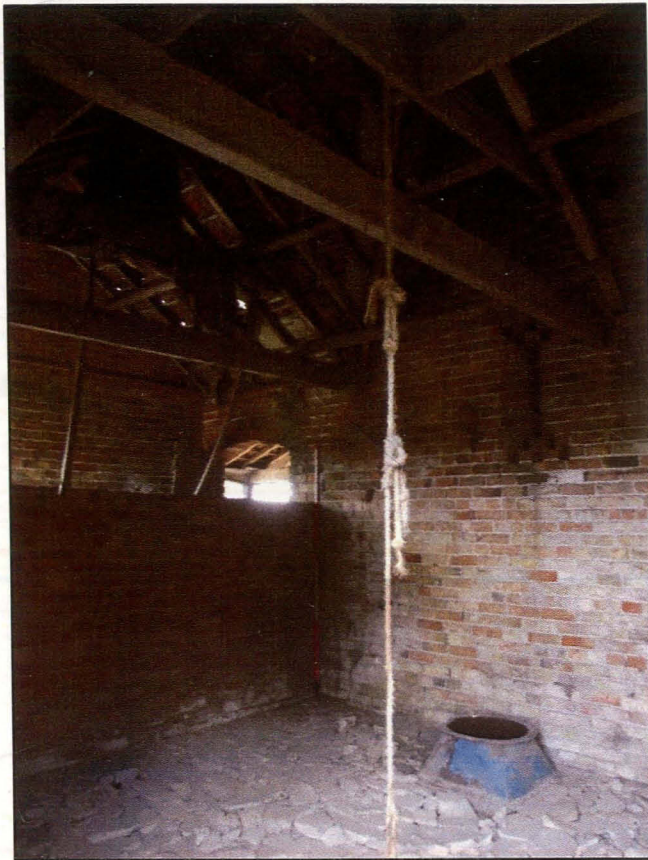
(Shot 68): Interior shot of grain dryer B7, showing partition wall, roof structure and a funnel likely to be associated with the drying process. Looking south-west
